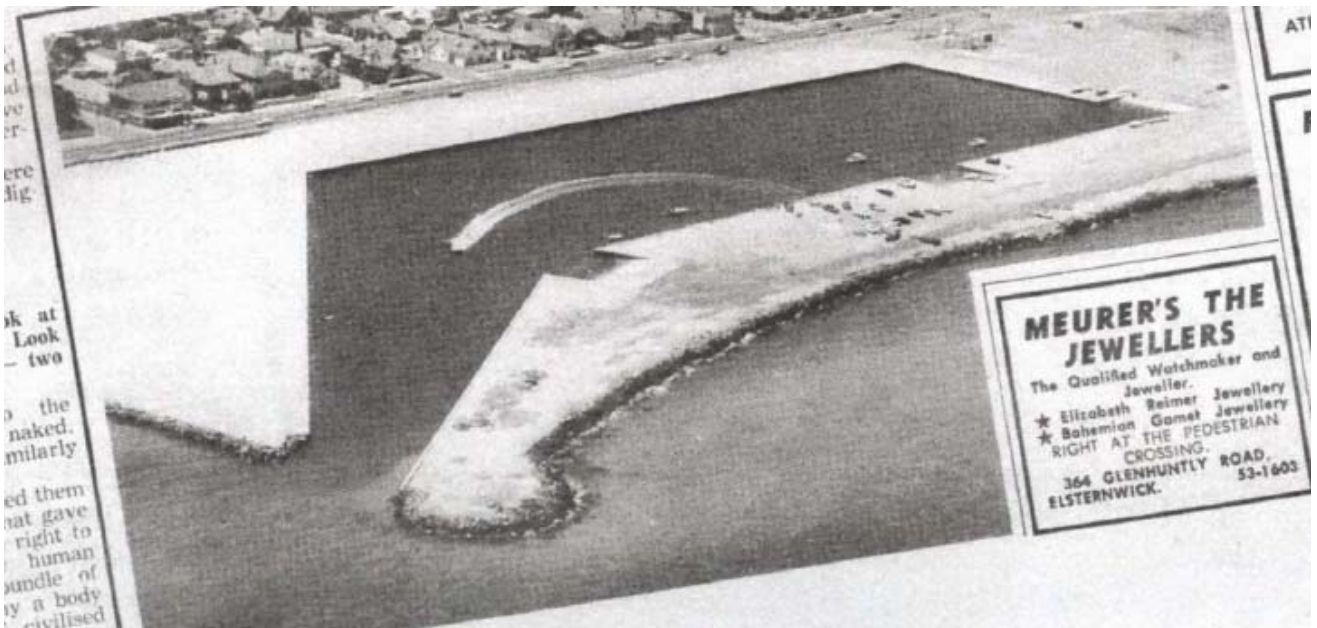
Stage 1 works of the St Kilda Marina Project (Southern Cross, 1968)
